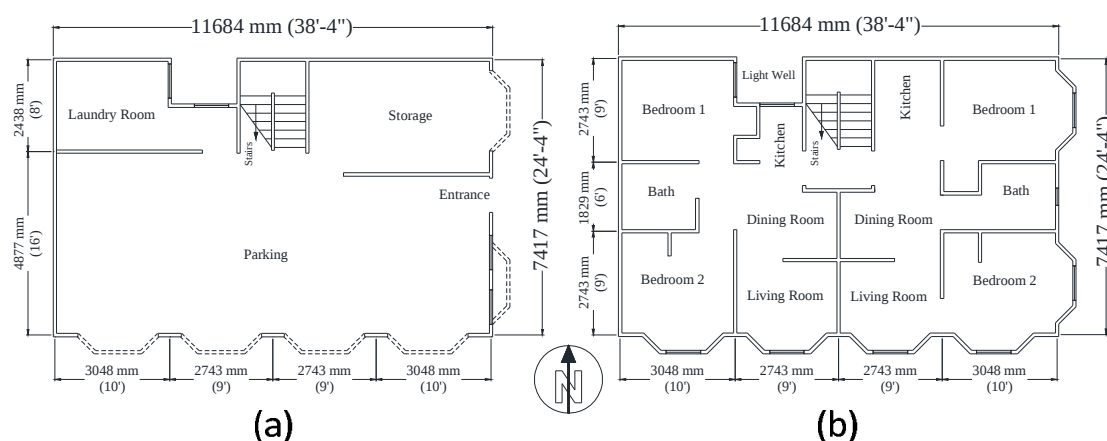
Floor plan for the 4-story shake table test building; (a) first story; (b) upper stories.
